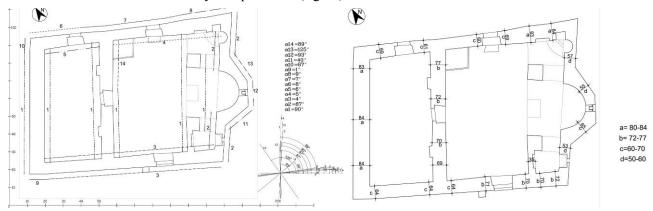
Study of wall alignments (left), Range of the wall thicknesses (right)
